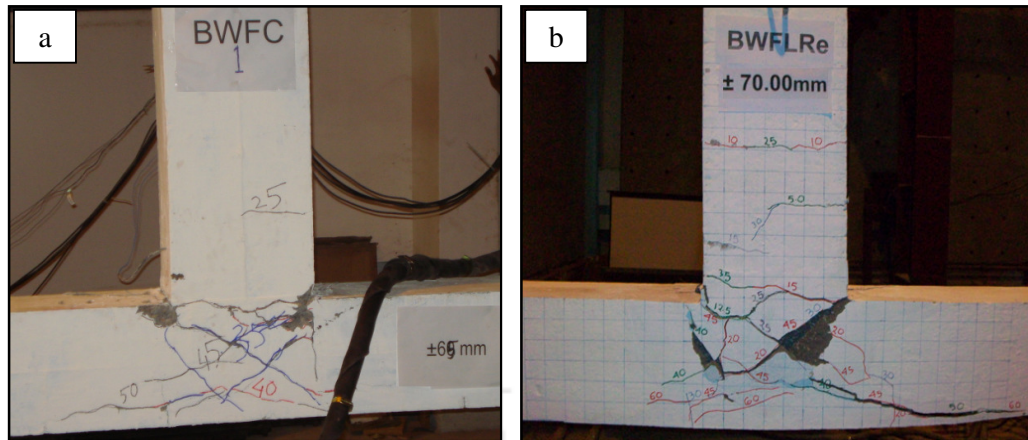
BWFL specimens at the end of test under loading type-1:
